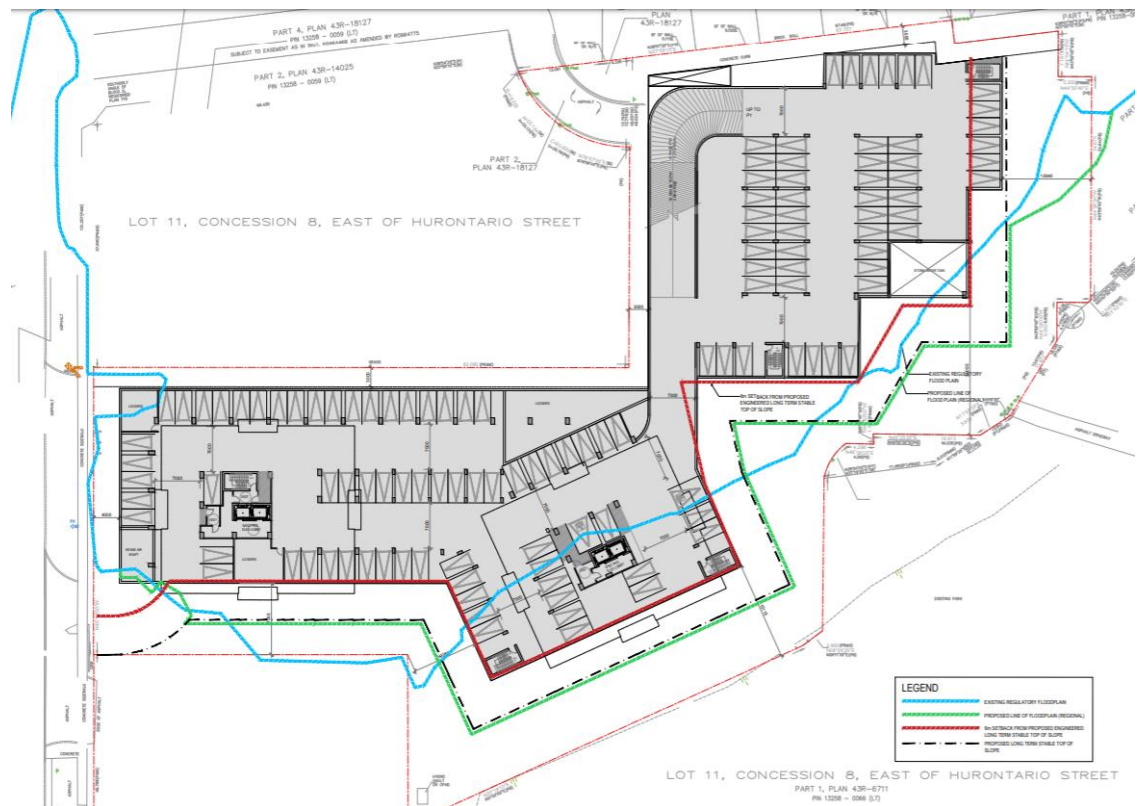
Levels 2 & 3 of Underground Parking Plan, prepared by IBI Group
